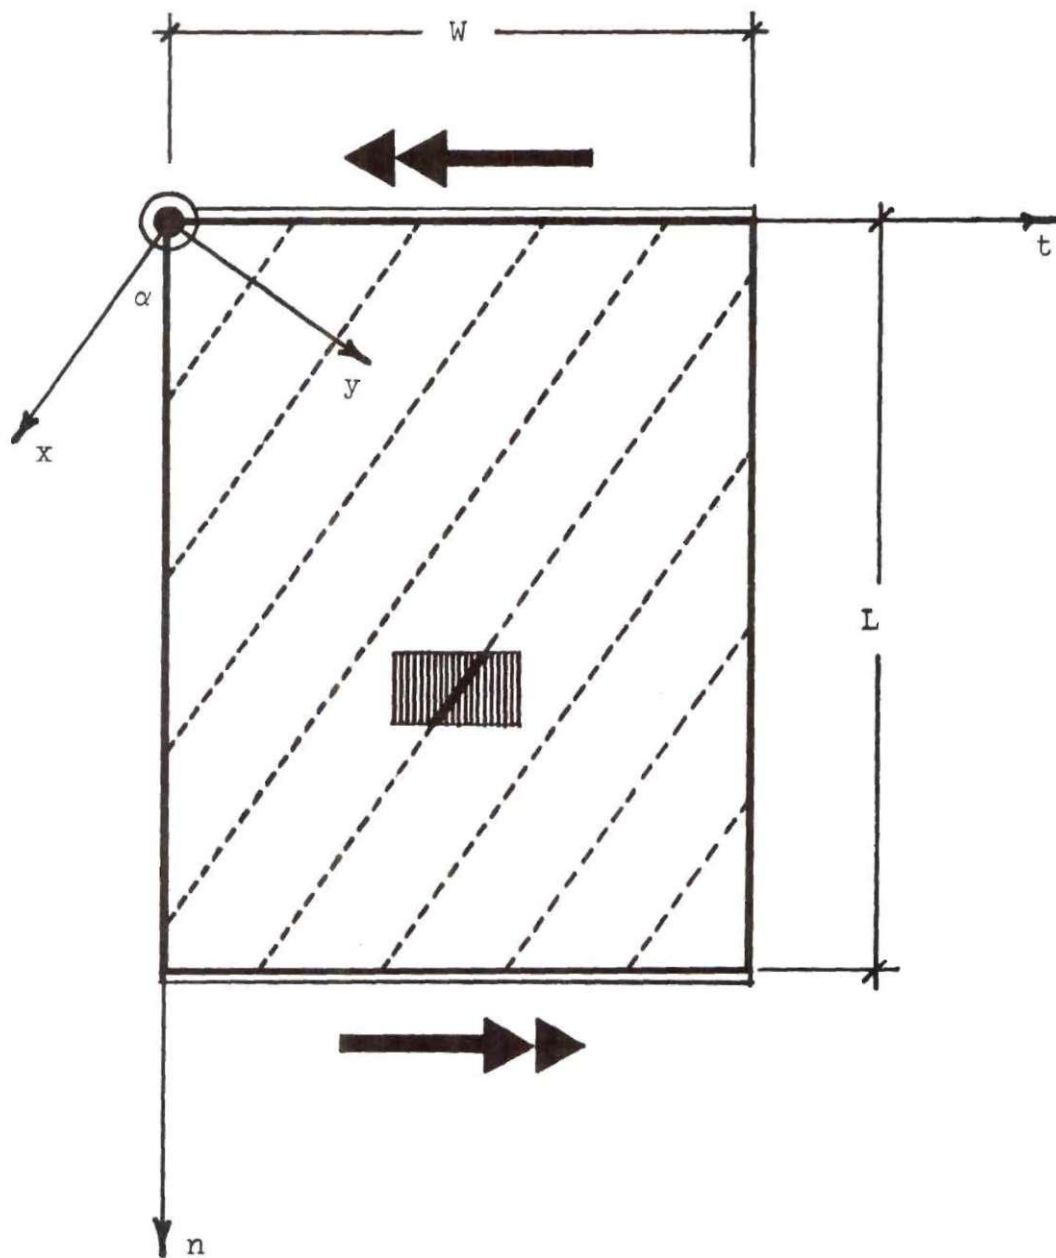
Plan View of Set-Up, Equivalent to Lenkei's for an Orthotropically Reinforced Concrete Slab.
